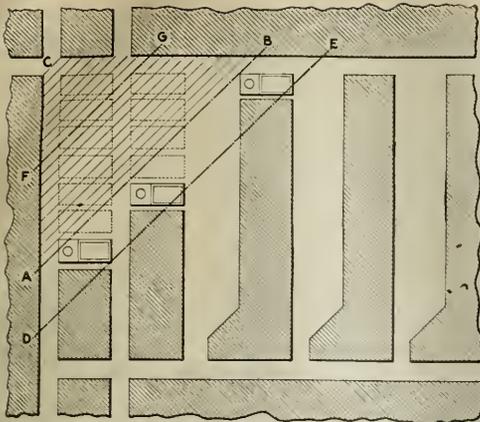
PLAN OF MINING WITH SHORT ROOMS
